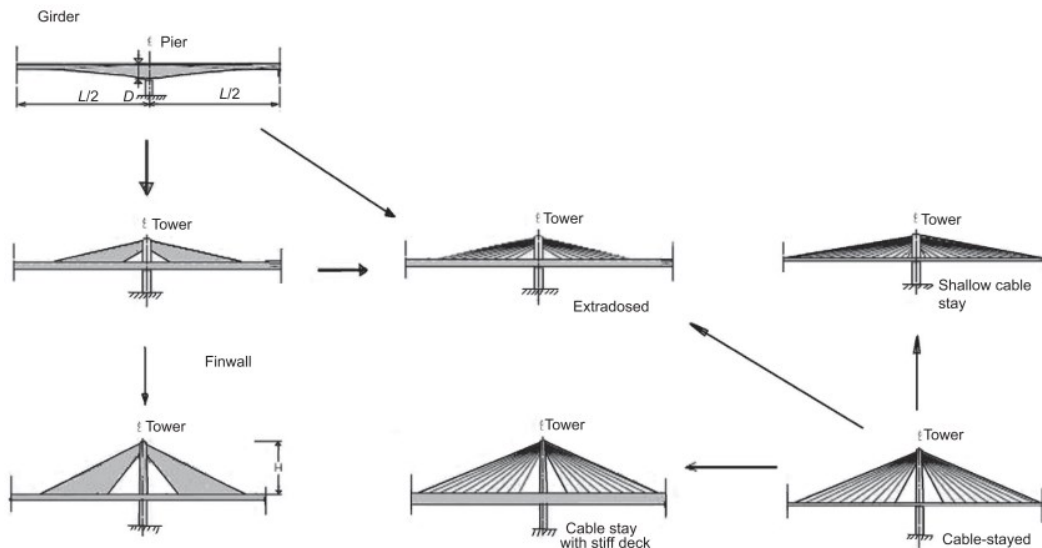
Typical Extradosed Bridge Arrangement (Collings and Gonzalez, 2013)
